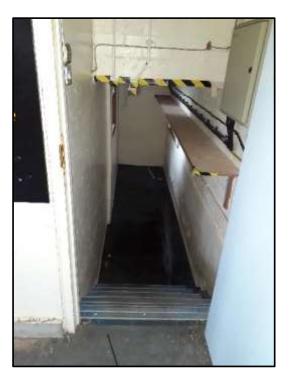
H Building, lower ground floor level of battery room extension to the north
